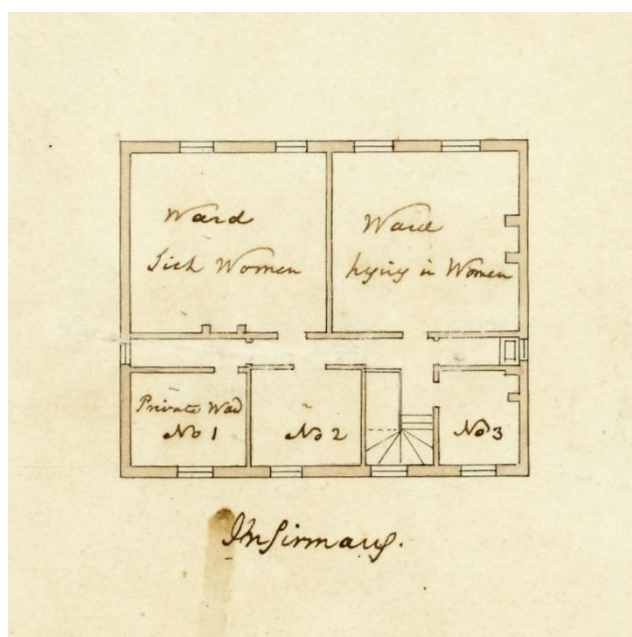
1838 Infirmary first-floor plan (CA: G/C/AP16)
